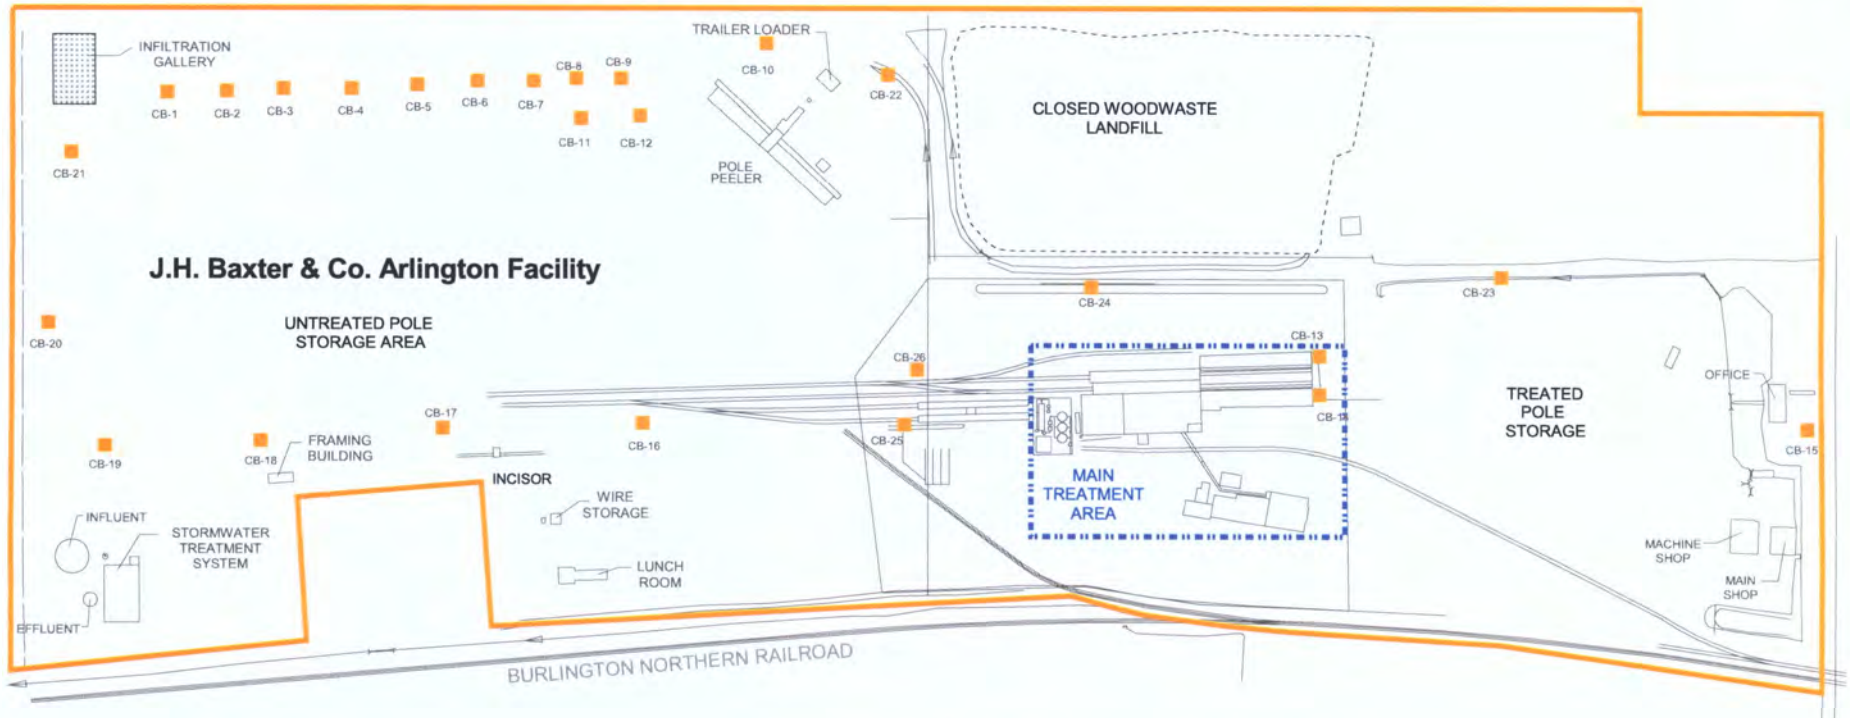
Site Plan - J.H. Baxter & Co. - Arlington, WA
